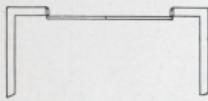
Floor plan showing position of closed doors, equipped with "SlydaSyde" BB hardware.
